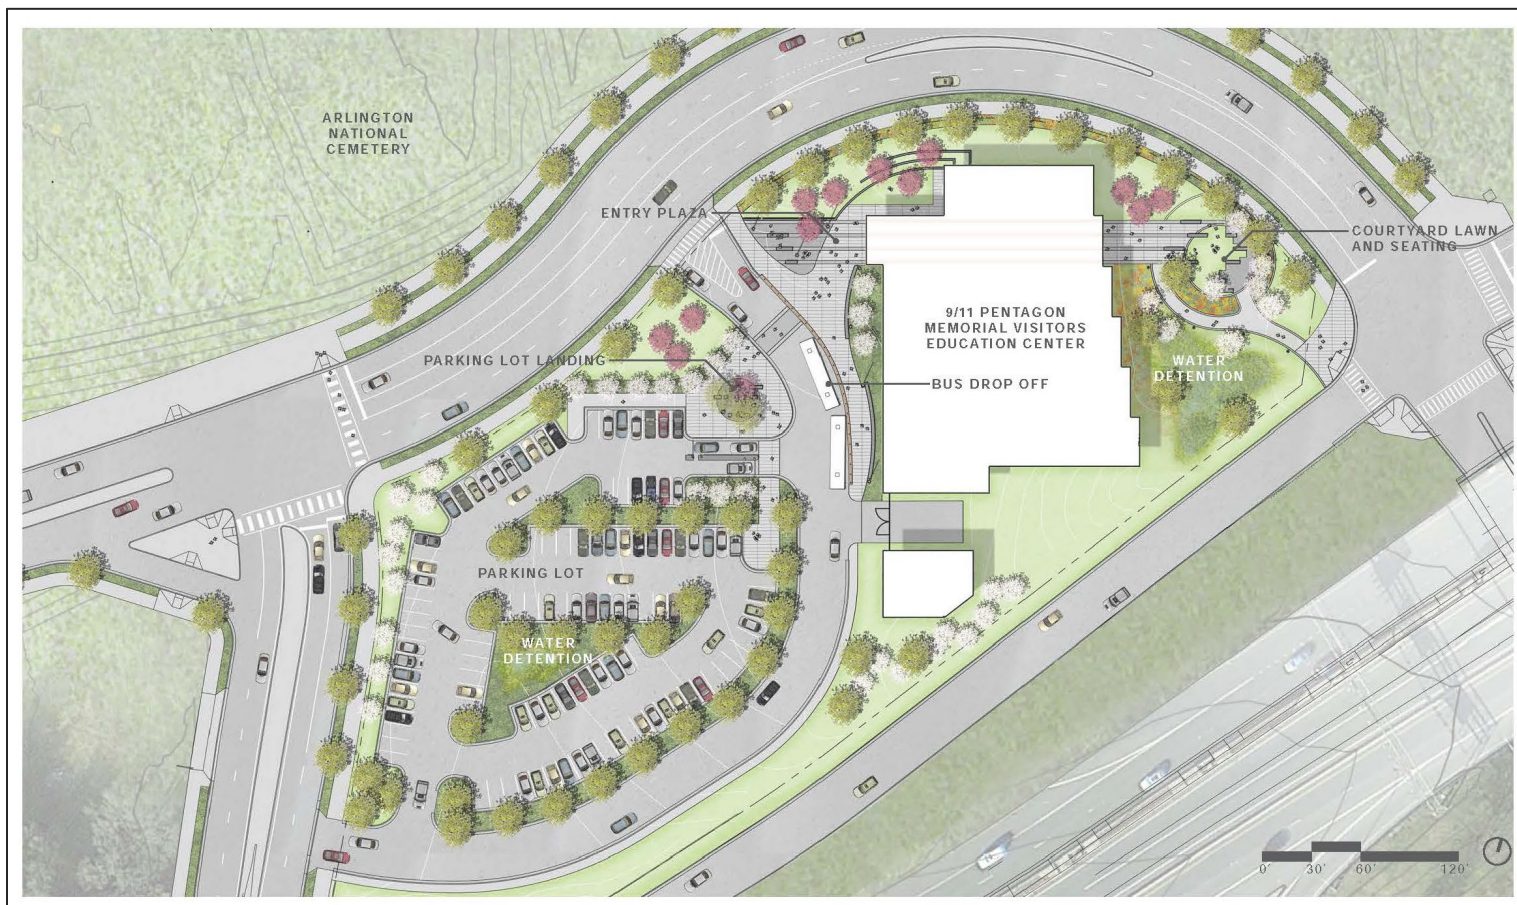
Proposed site plan as of March 2023 (Source: Fentress Architects)
